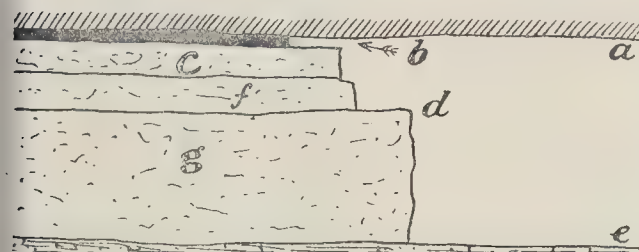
Section of heading underground, showing method of quarrying Bath stone.
